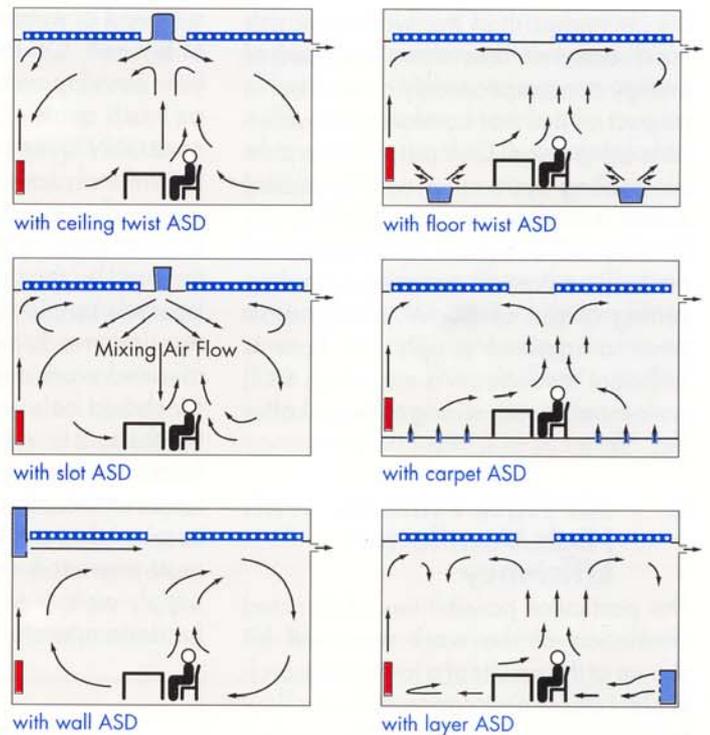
Cooling ceiling systems and air flow pattern concepts
